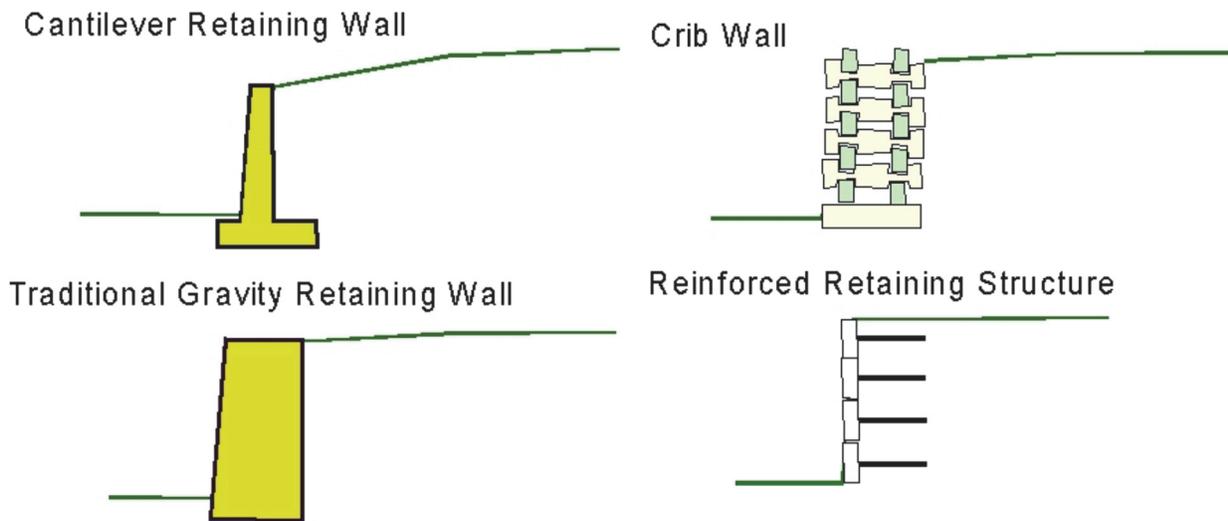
Examples of different types of retaining walls utilized in residential construction (image credit: Exponent).
